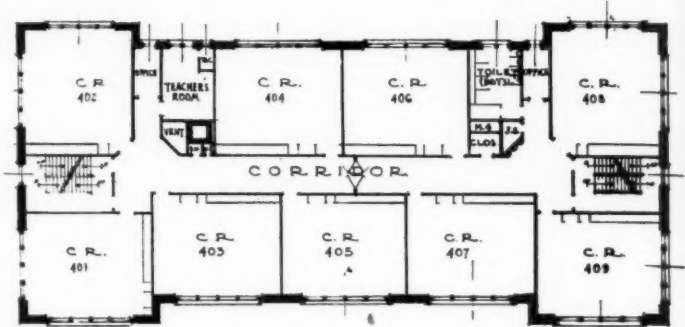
FOURTH FLOOR PLAN. TYPE "C" ELEMENTARY SCHOOL
